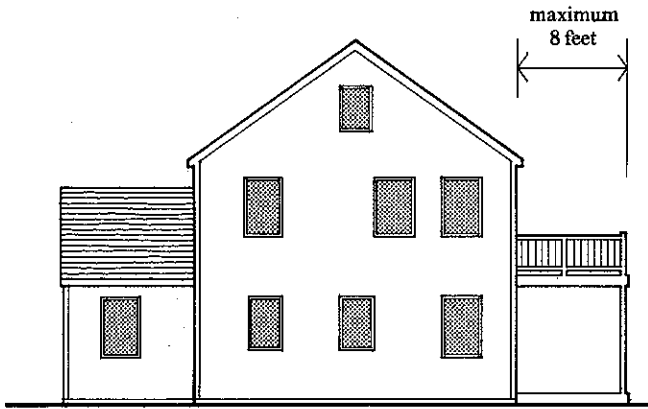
Maximum extension of isolated deck, eight feet from wall plane.
